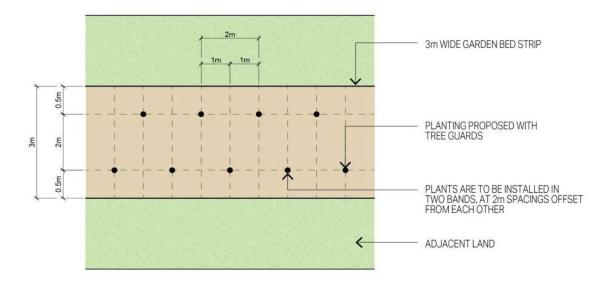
Example of a vegetation layout plan (dimensions subject to extent of screening as determined by the landscape architect)
